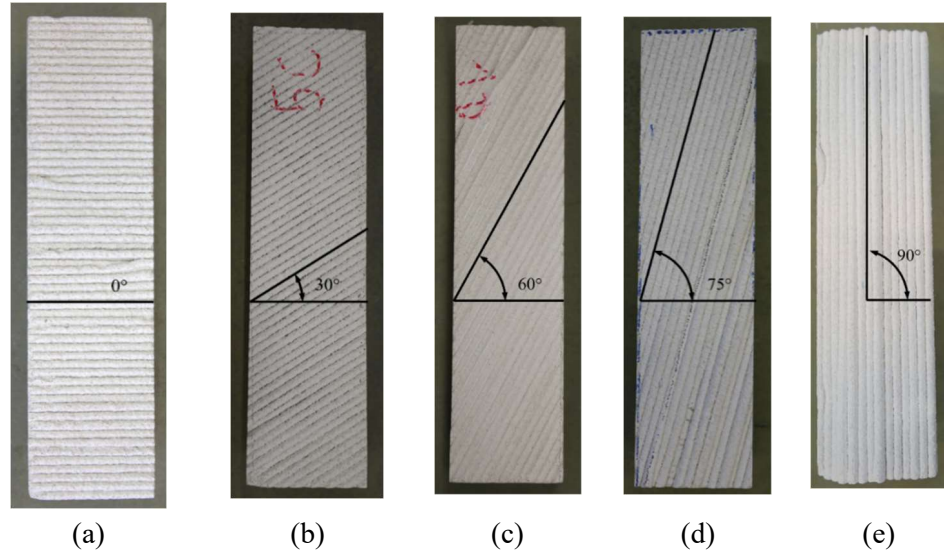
3D printed concrete specimens with different concrete layer inclinations to the horizontal plane: a) 0°, b) 30°, c) 60°, d) 75° and e) 90°.
